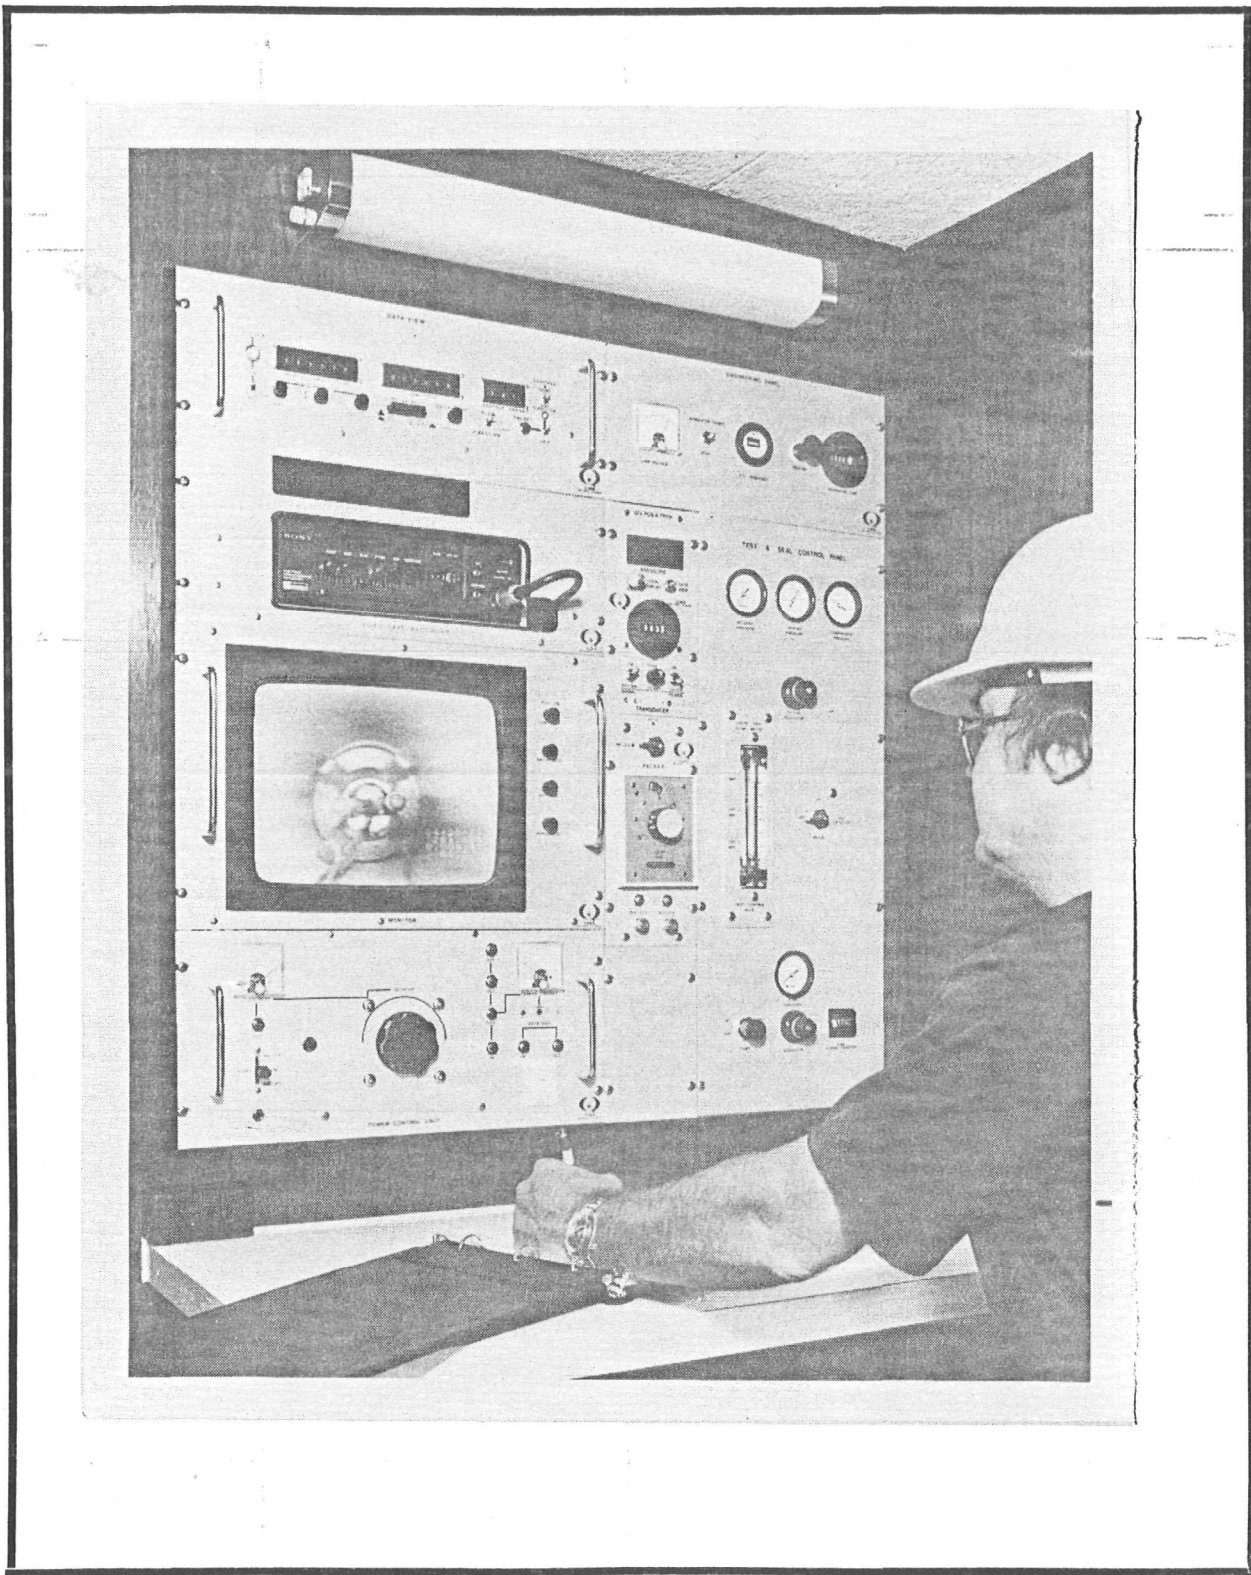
Preinspection of Sewer — Courtesy Cues, Inc.
